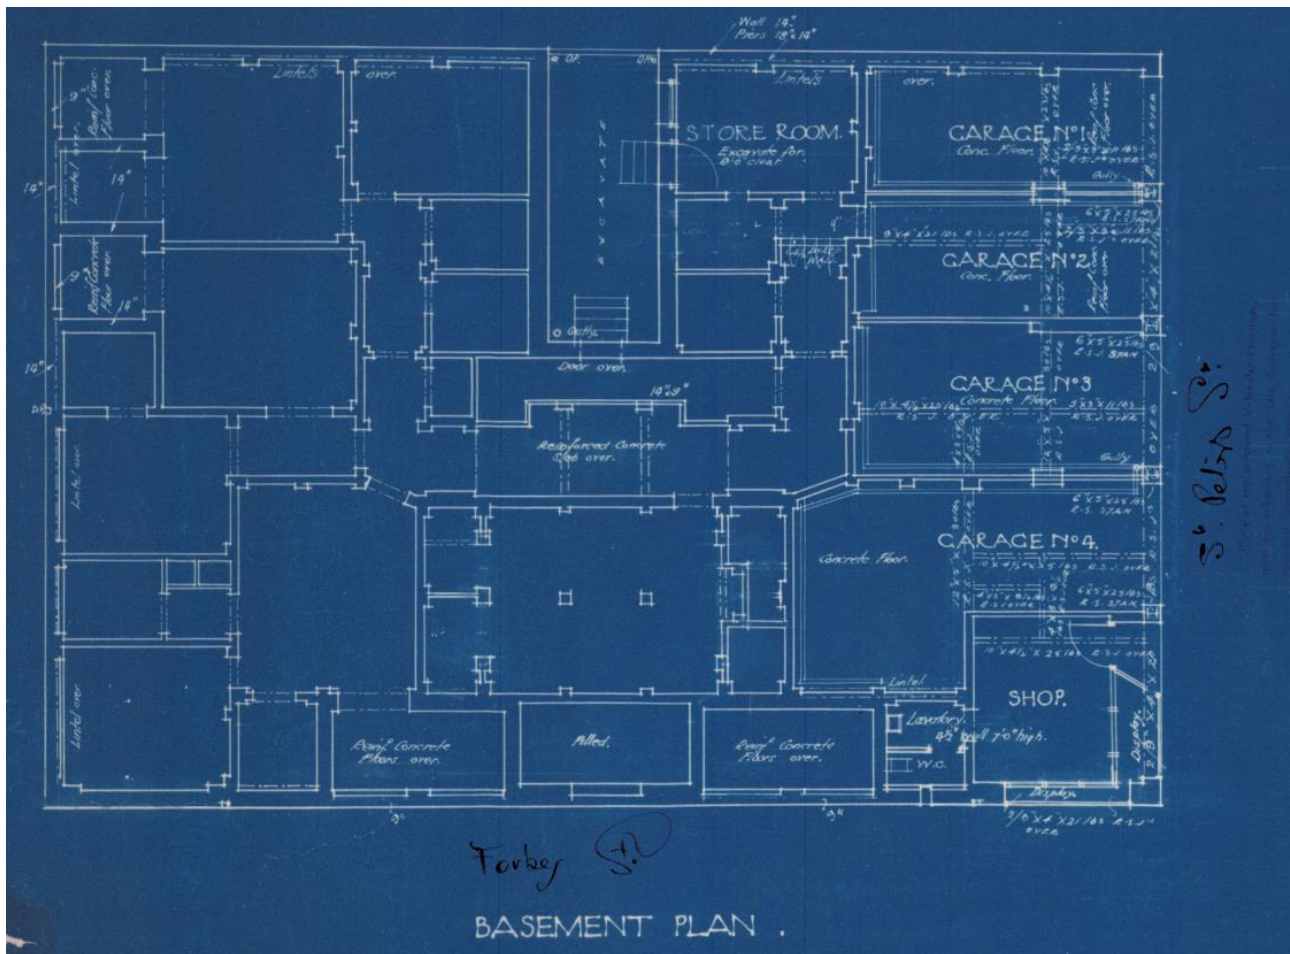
Original basement plan and layout of Wilkinson House, 1926.
